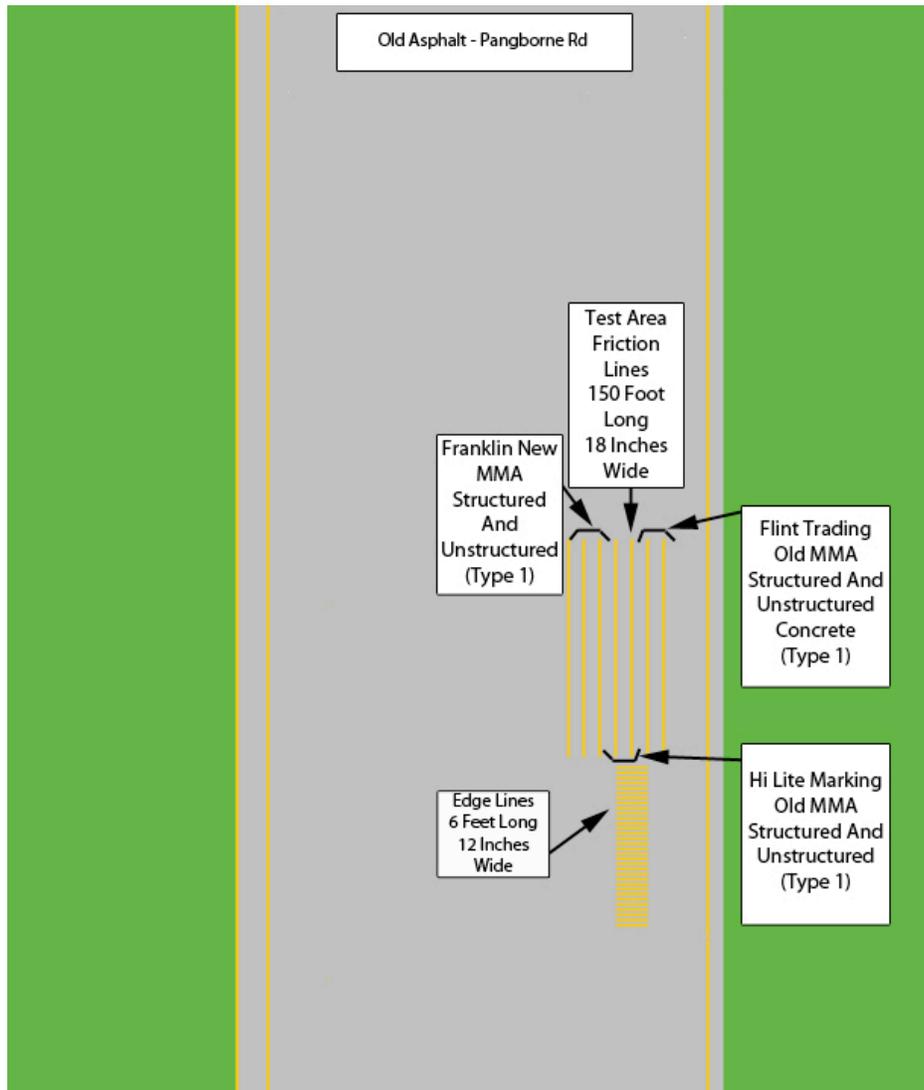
Layout of Test Stripes on Pangborn Road (Asphalt)
